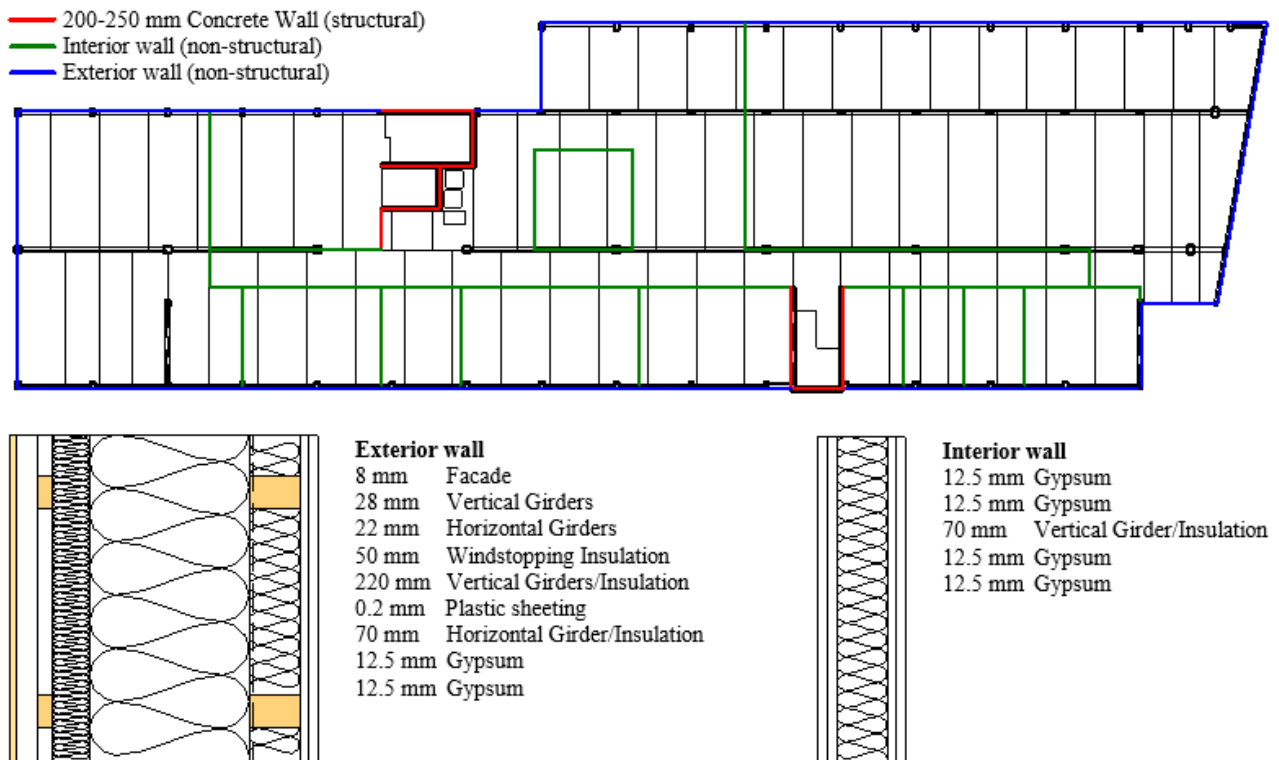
Wall section details shown on a floor layout of the 3<sup>rd</sup> floor in House Charlie.
